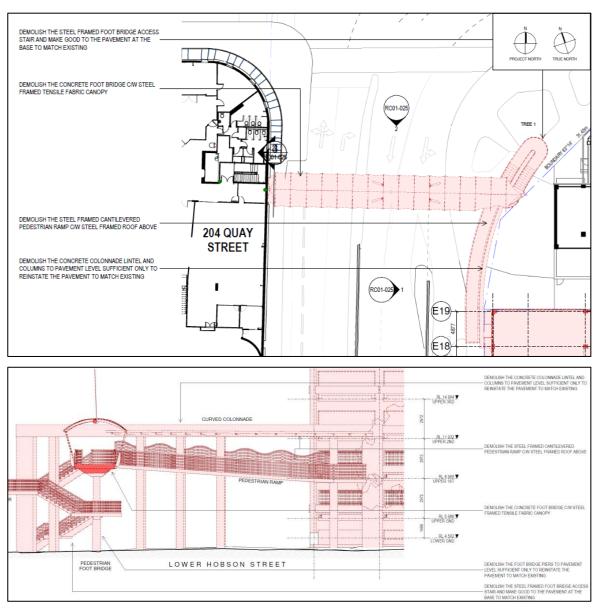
Plans showing the demolition and remediation works for the pedestrian overbridge (source: Warren and Mahoney)
